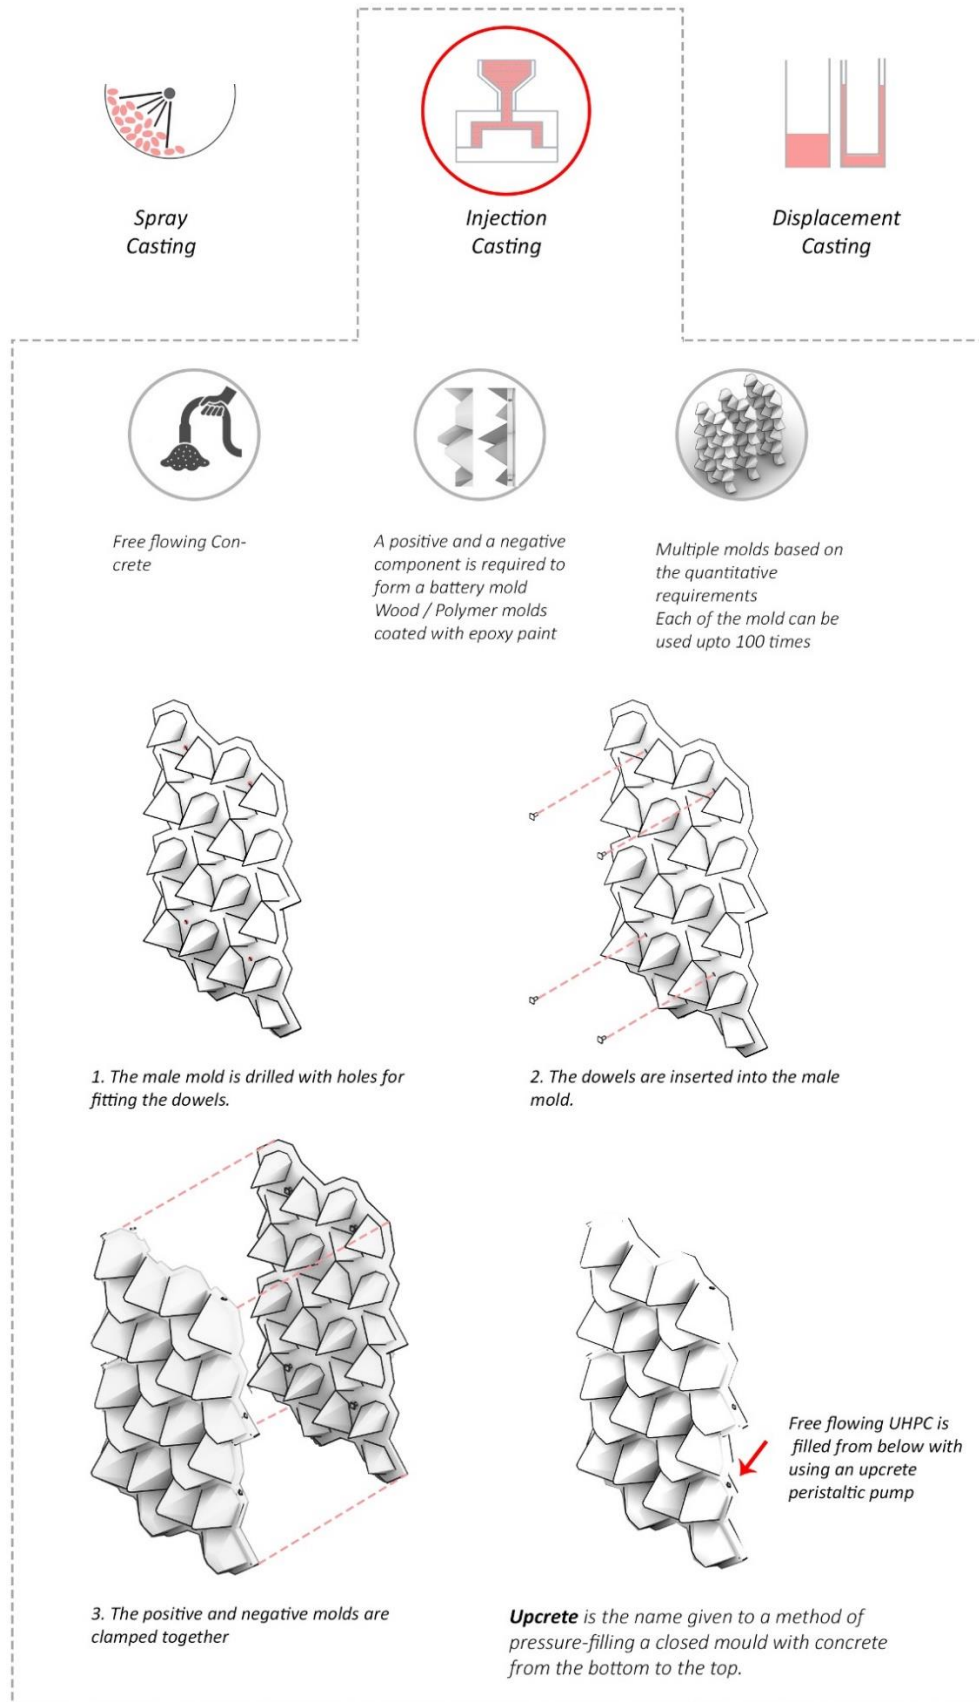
Process of Injection casting of UHPC using a male and a female mold for the façade panel.
